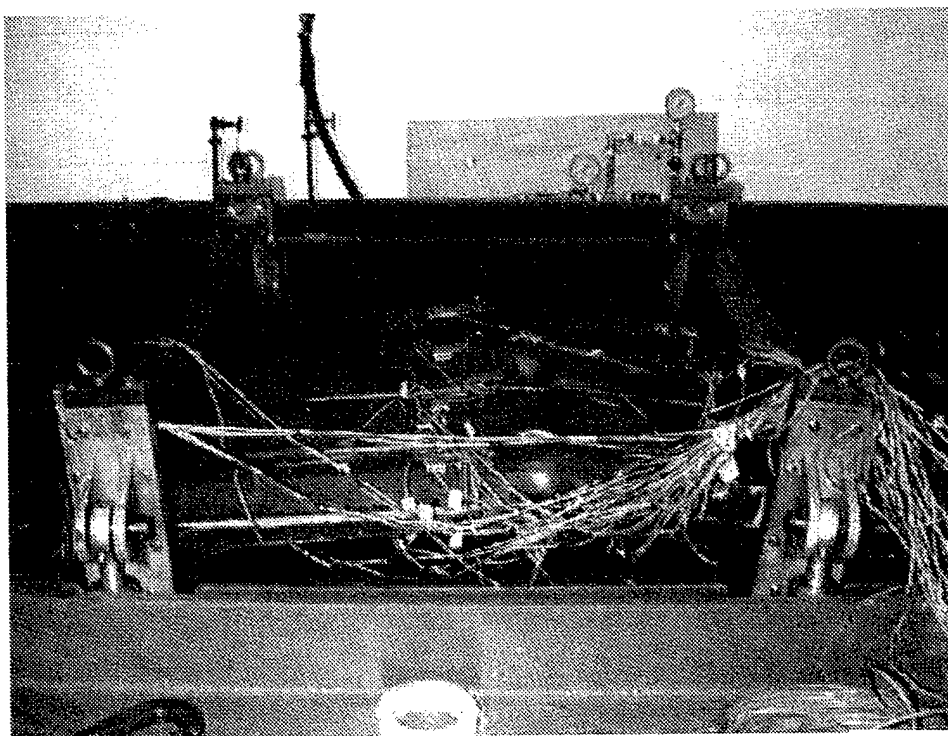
Grillage 0894 in Test Fixture after Collapse - Side View
